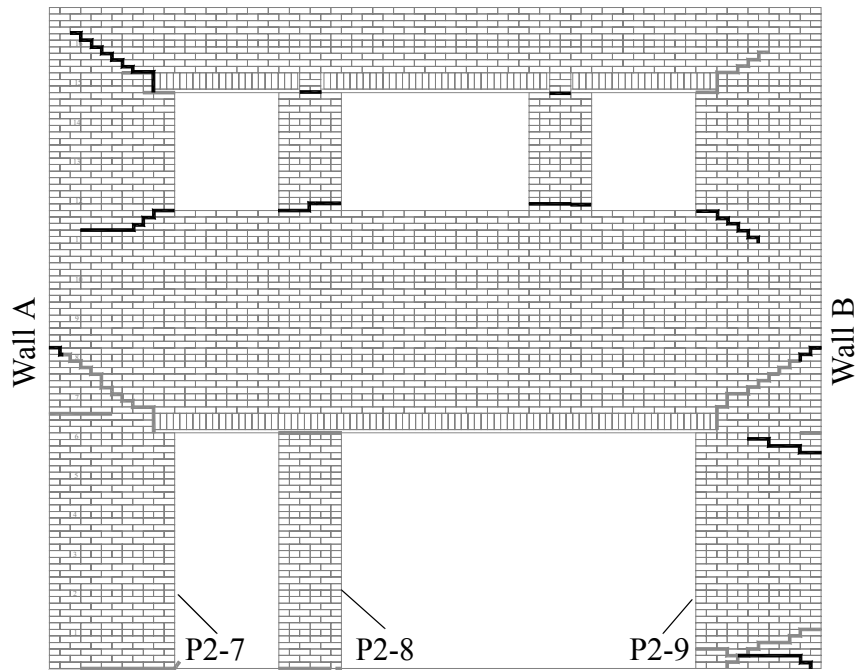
Crack pattern in Wall 2 following Test Run 19.
